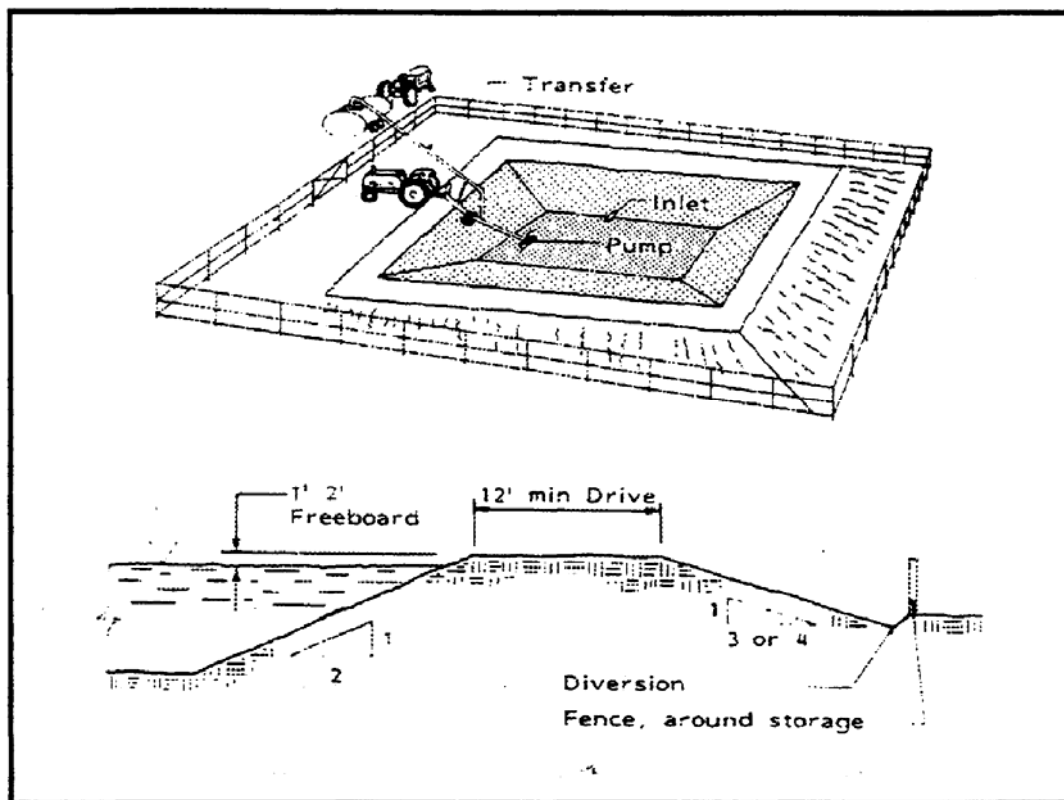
Earth basins for manure and dairy wastewater storage. *Source: Dairy and Equipment Housing Handbook, MWPS-7, Midwest Plan Service, Ames, Iowa.
